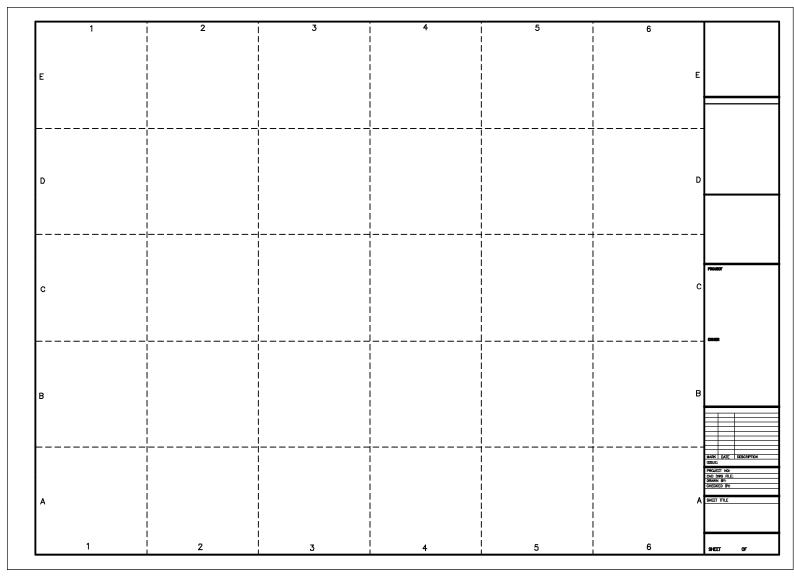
11" × 17" Mock-up sheet of a full size ANSI D 34" × 44" sheet.
